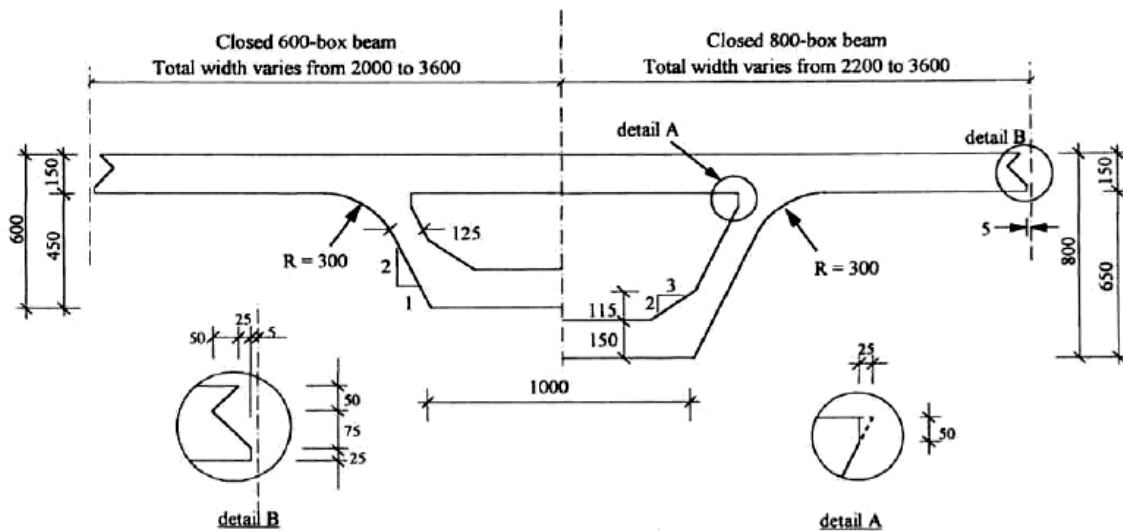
Cross section of the closed trapezoidal box beam (dimensions are in mm) (Badie et al., 1999)
